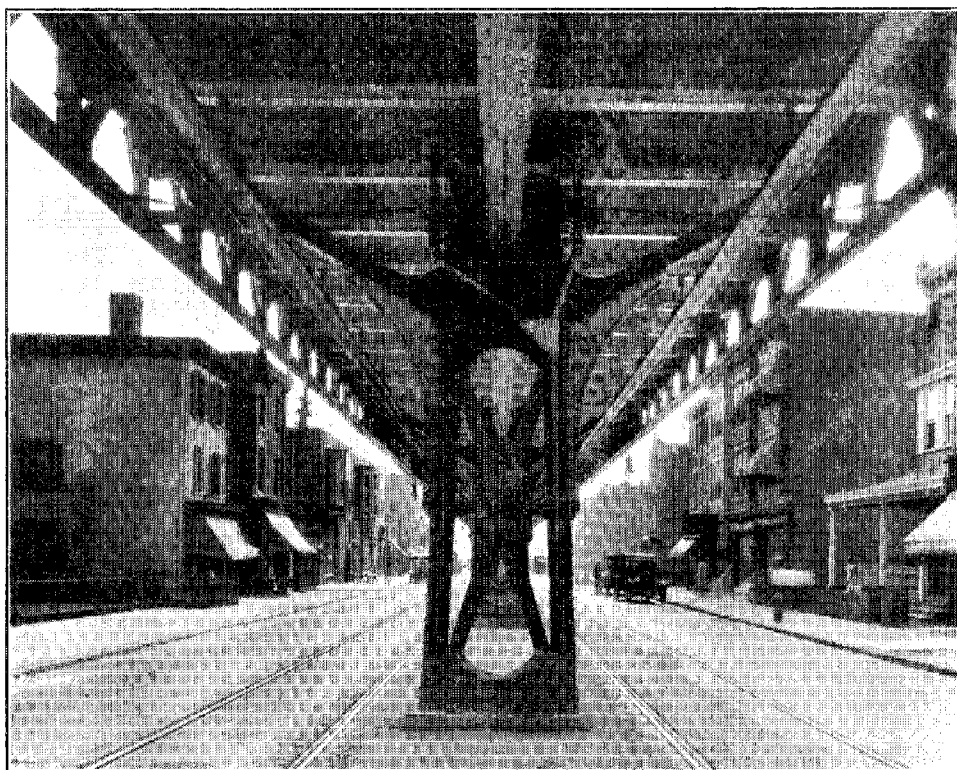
Single column solid deck construction on the Frankford Elevated Railway in Philadelphia.
